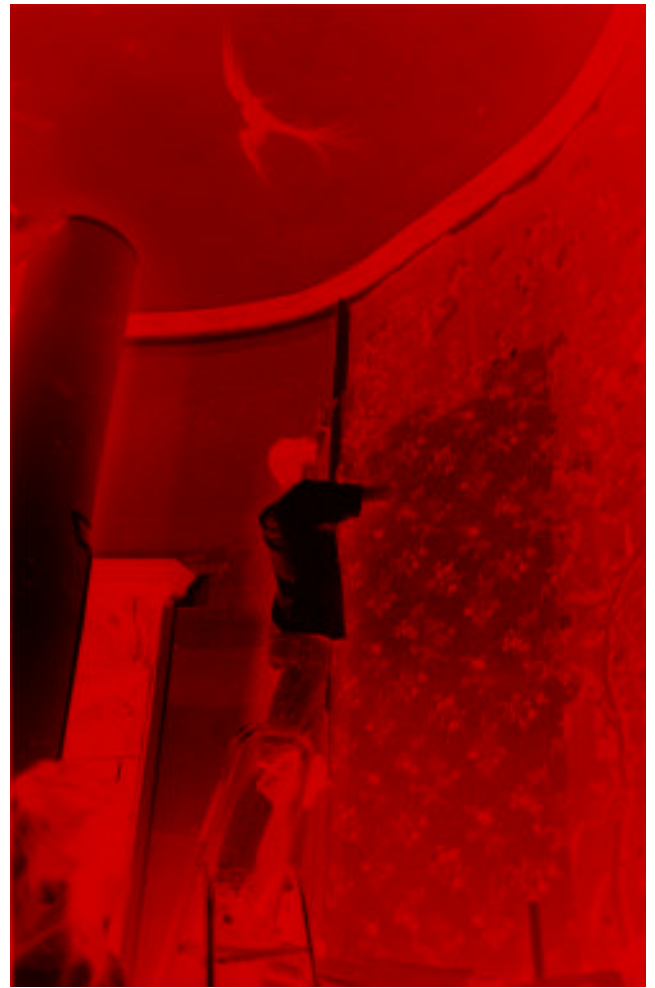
Remounting the wallpaper with hook and loop fastening bands.
